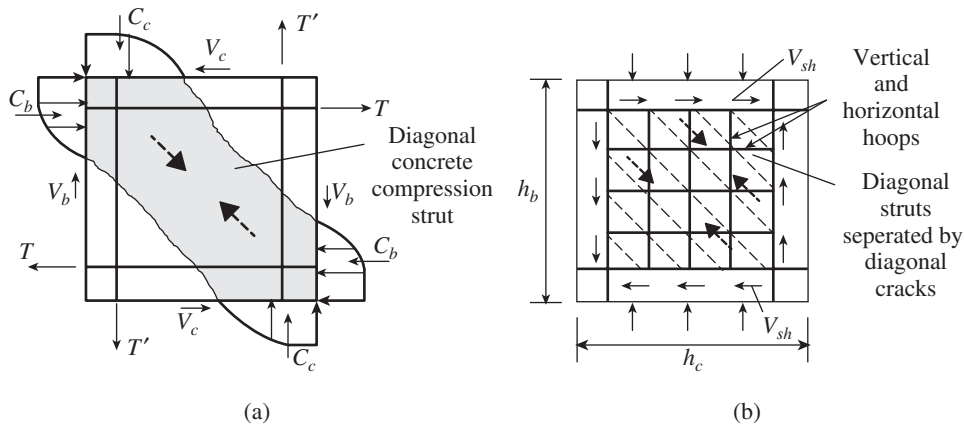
Joint shear resistance mechanisms (a) Concrete strut mechanism (b) Concrete truss mechanism
